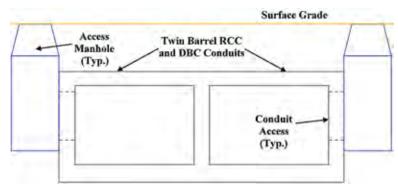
Sketch of Roxbury Canal and Dorchester Brook conduits
